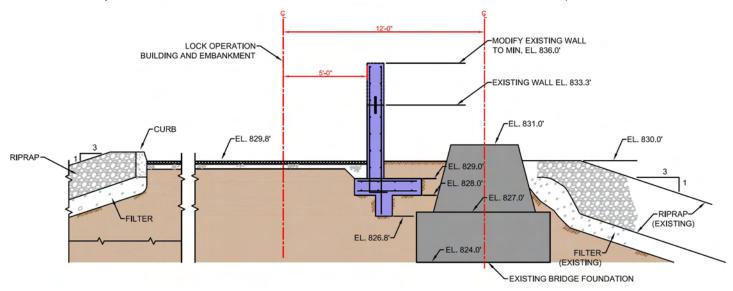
Fort Loudoun Dam – Concrete Floodwall Concept for Segment FTL-2 (Under U.S. Highway 321 Bridge)
